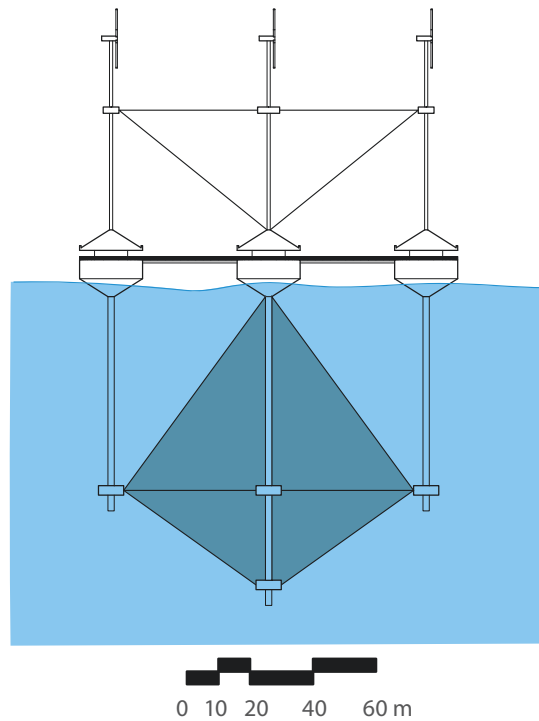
Elevation of one base unit, showing compression member walkways and tension cables above and below.
